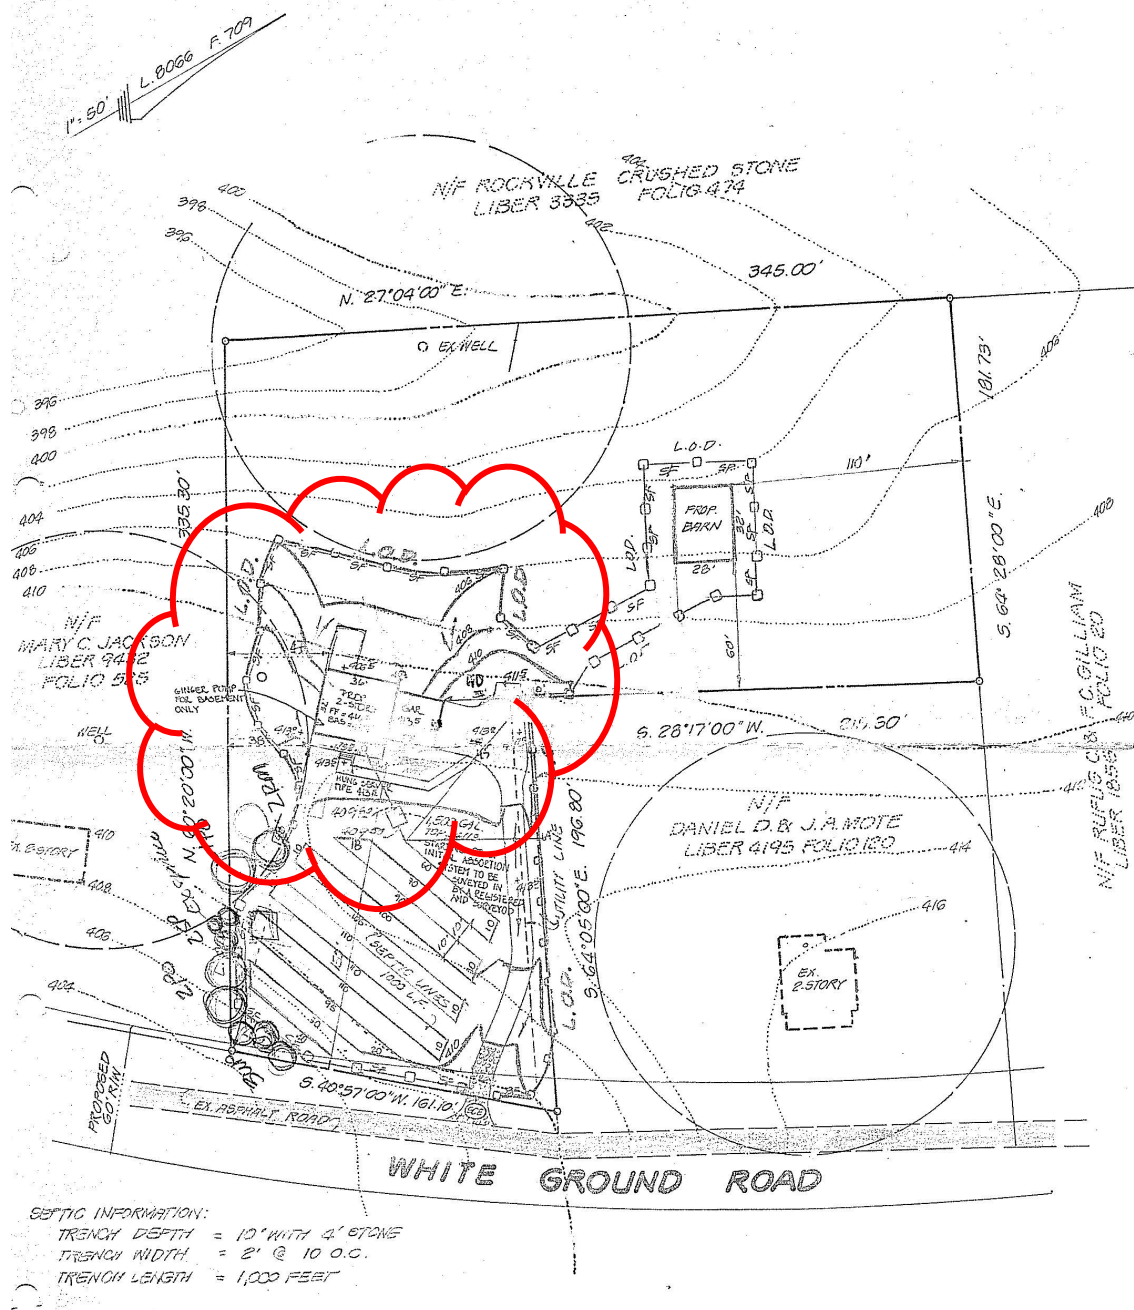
The site plan for HAWP #18/08-02C at 19820 White Ground Road. The proposed house location set back about 150 feet from White Ground Road is clouded in red.
